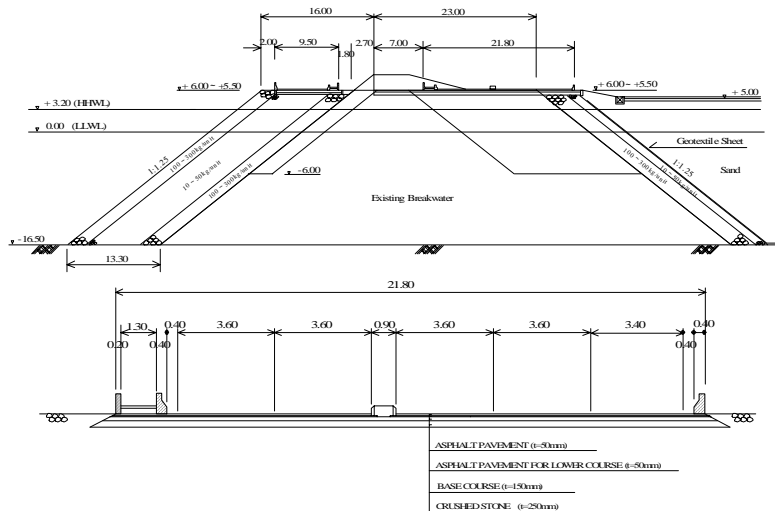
Cross Section of Port Road on Existing Breakwater
